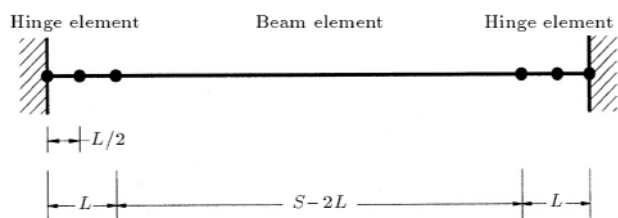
Modeling of the reduced web section beams with a beam and two mixed hinge elements.
